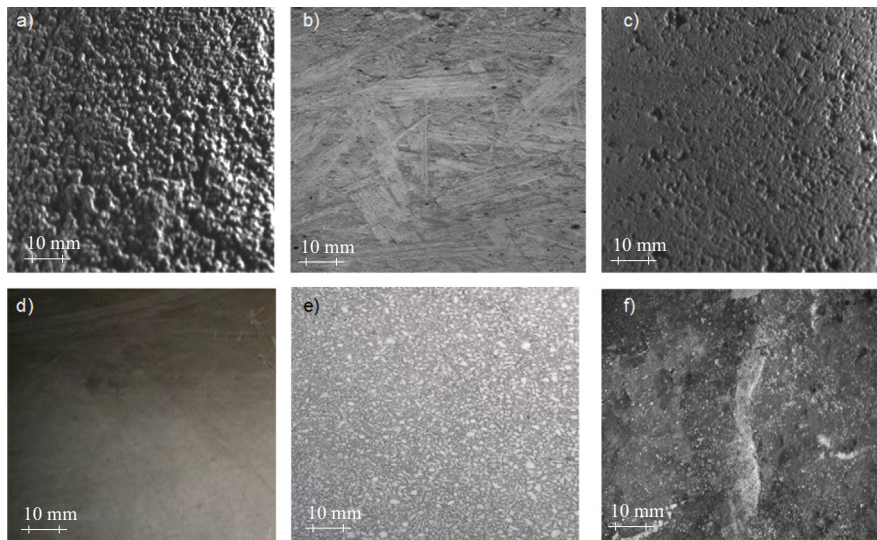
Black and white optical view of concrete surfaces: a) as cast, b) raw concrete formwork, c) ground, d) architectural, e) polished, f) aged concrete.
